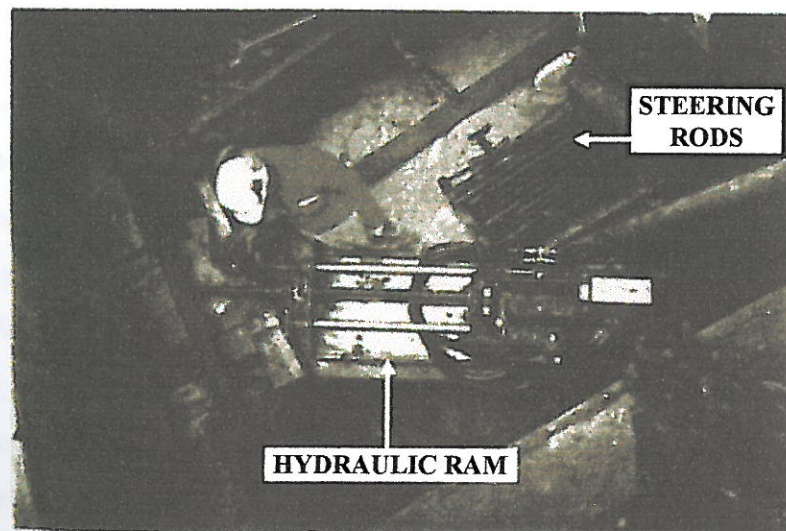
Plan view of "Grundohit" hydraulic ram, as used by A.E. Bartholomew for the installation of the experimental Mole Drains.
